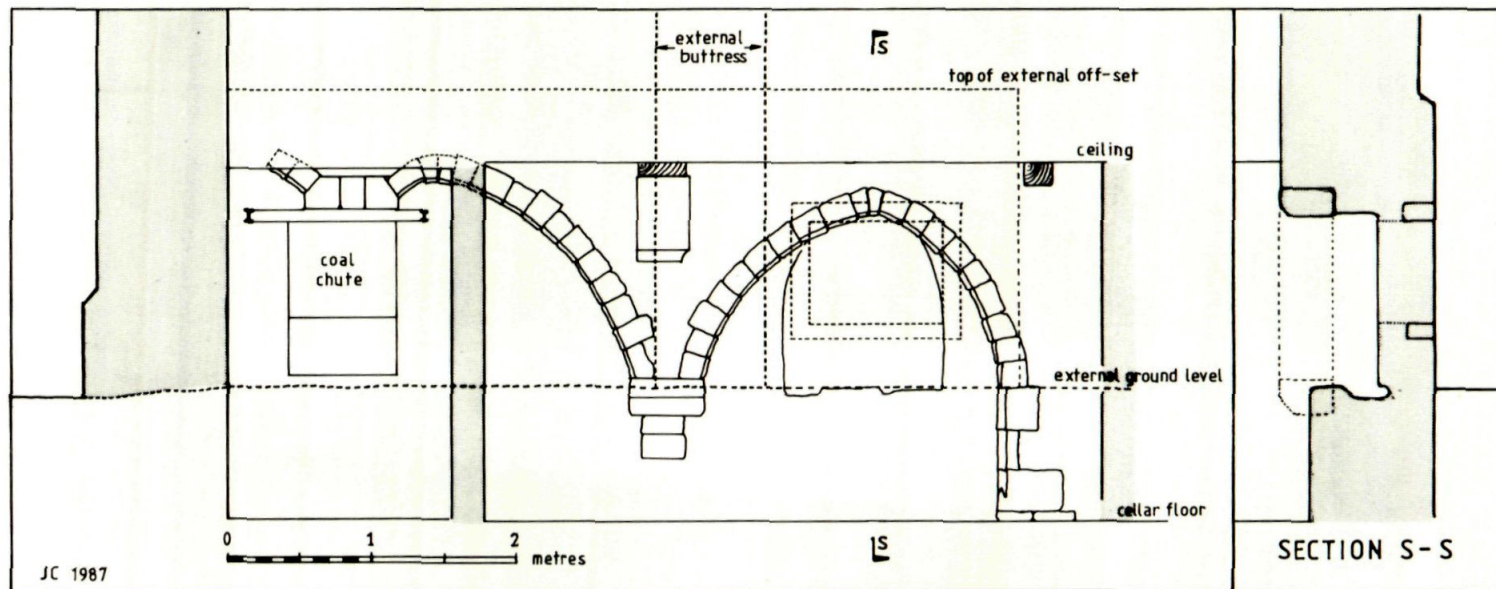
East elevation and section of arcading at south end of west wall of Prior's Hall. Pecked lines on elevation indicate position of external features.
